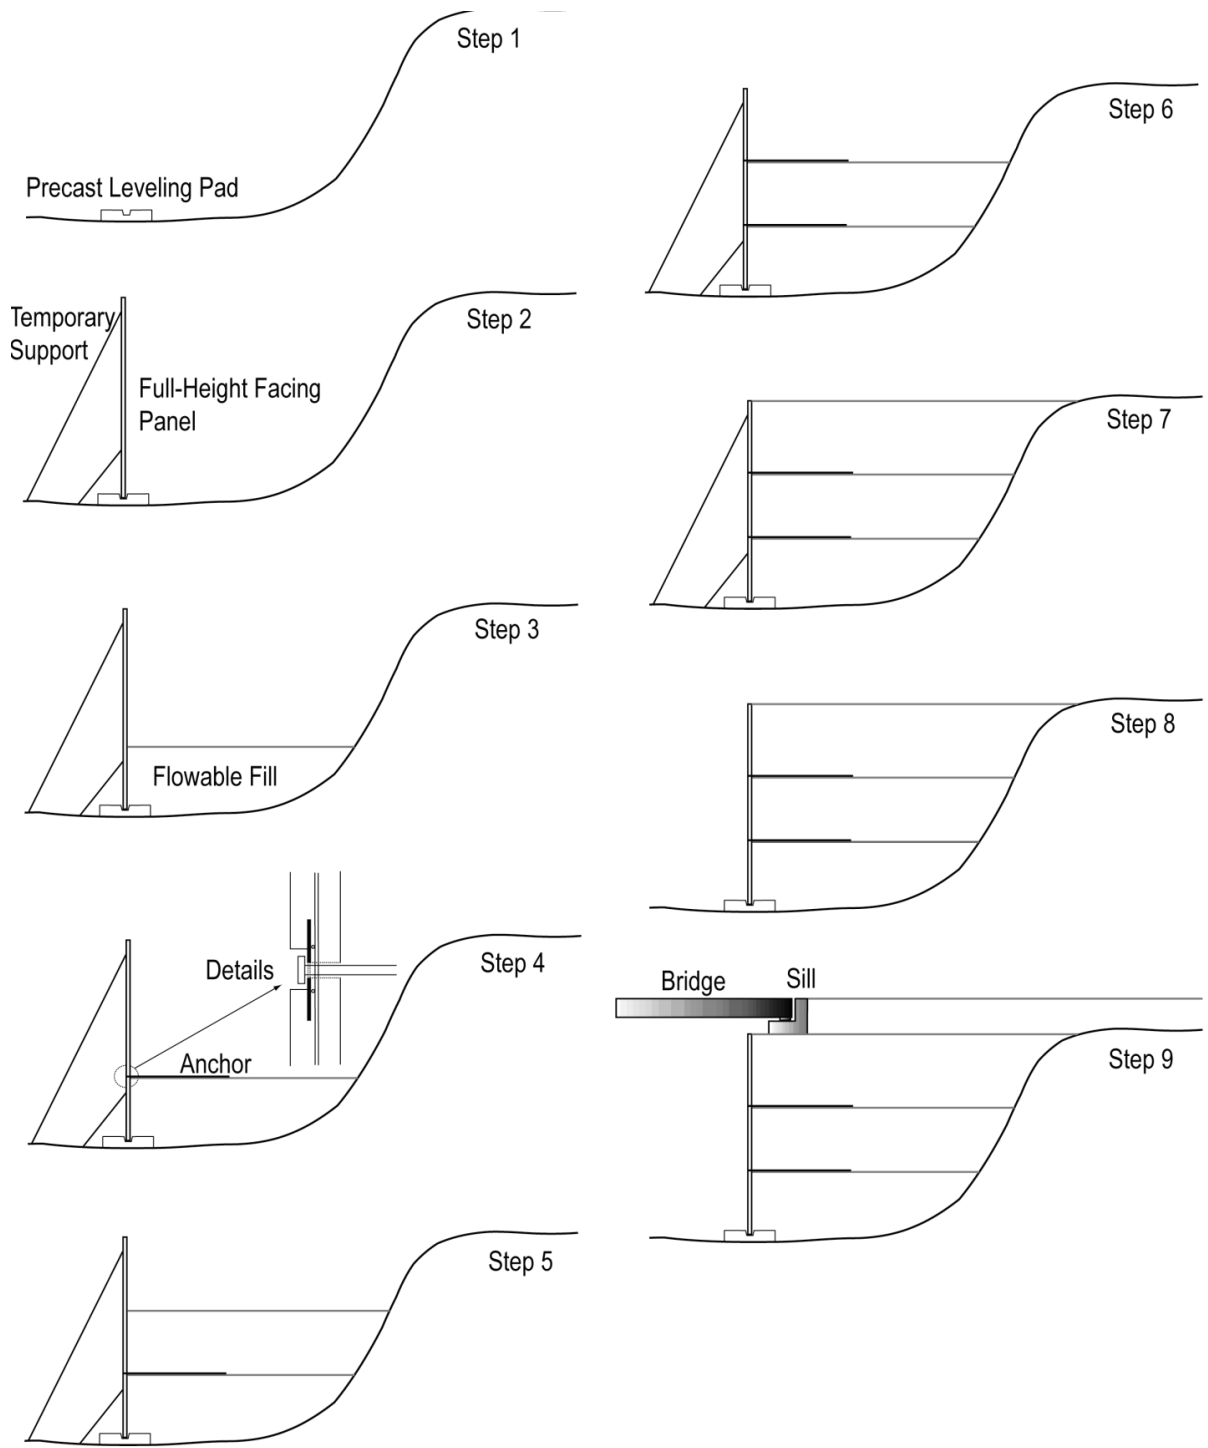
Construction Sequence of CLSM Bridge abutment.
